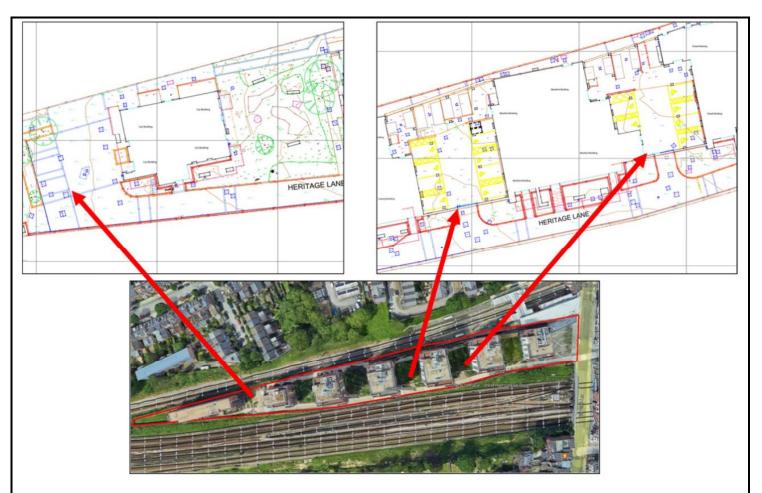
Topographical Excerpts showing the location of parking spaces (source WSP Car Parking Management Plan Addendum)
